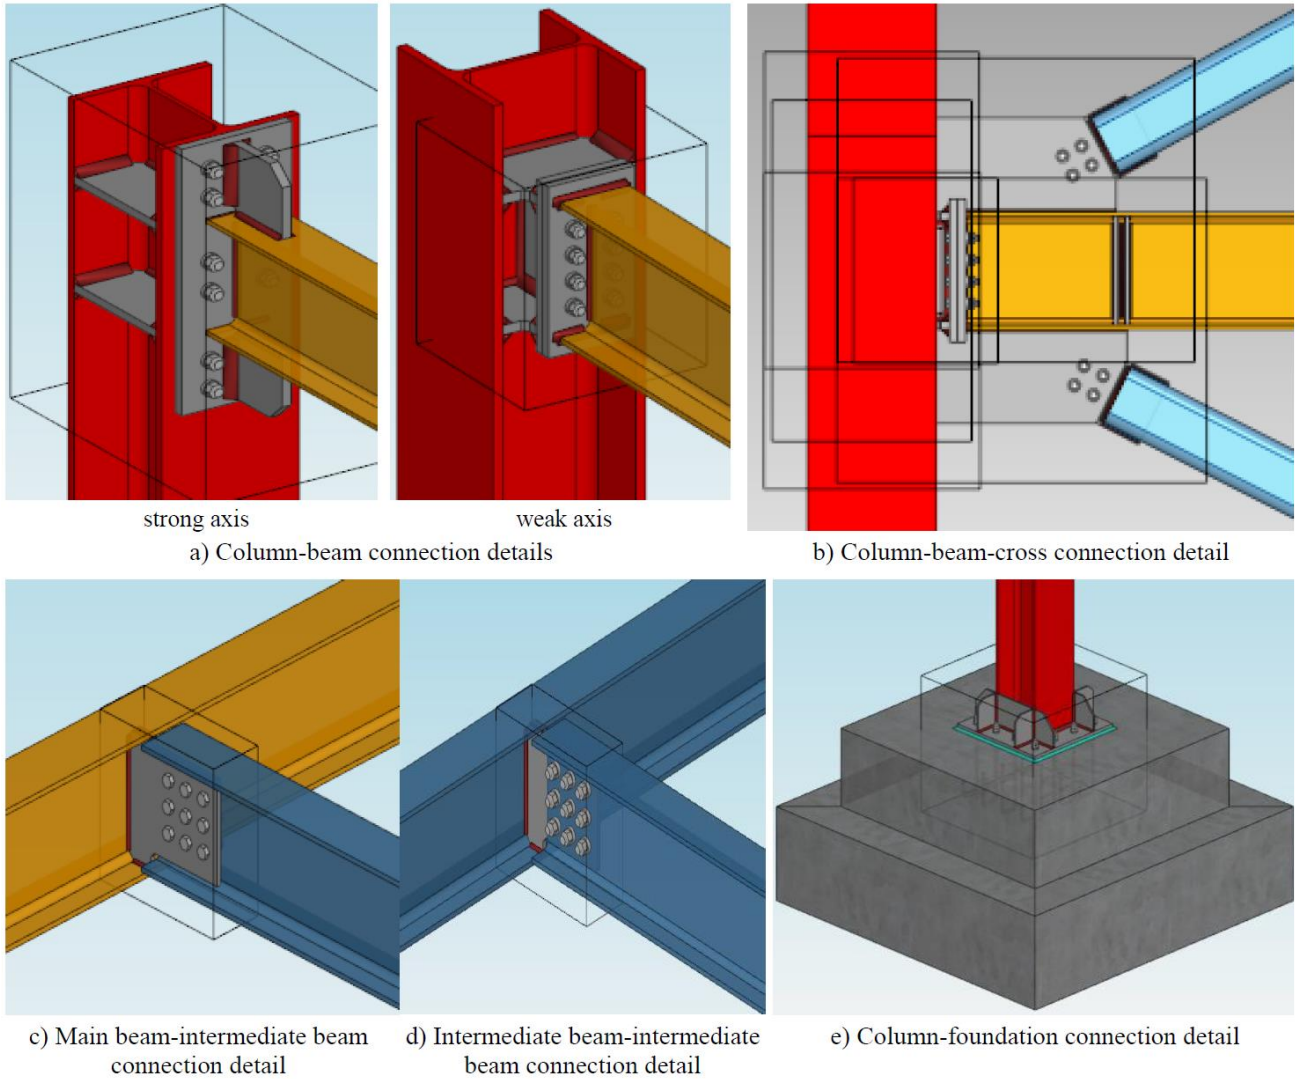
Details of nodal point created as bolted and welded of the considered frames
